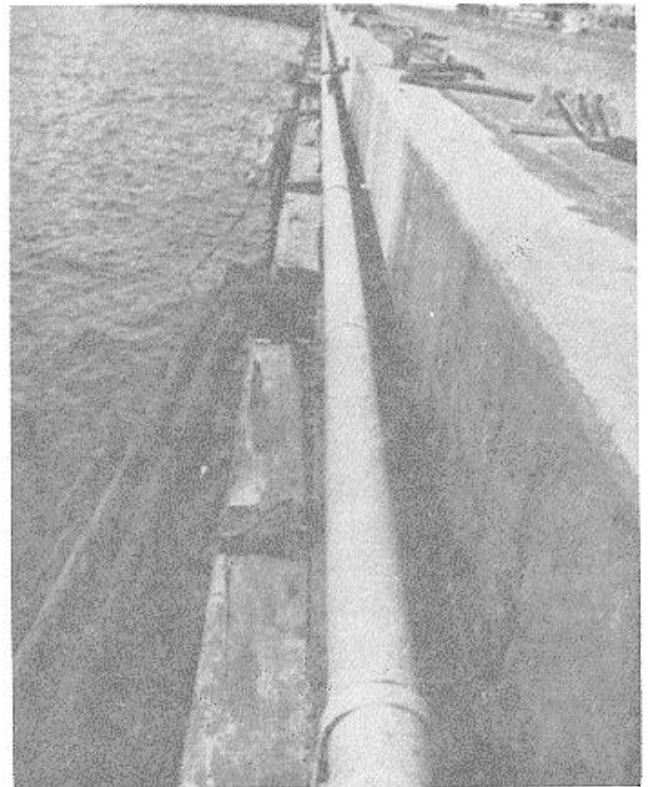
Typical example of corrosion damage to sheet piling.
